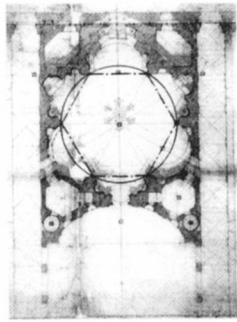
Borromini, pavement plan, design drawing with reconstructed conditions, October 1660
